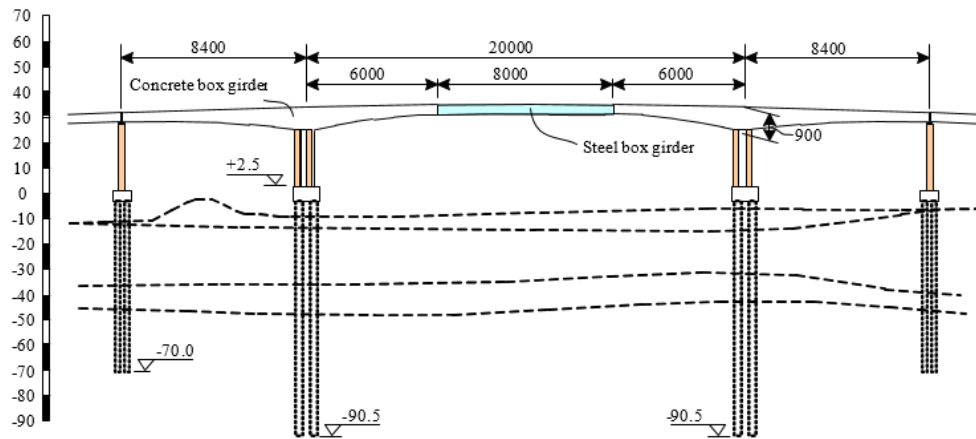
The Layout of Oujiang Bridge (Unit: cm)
